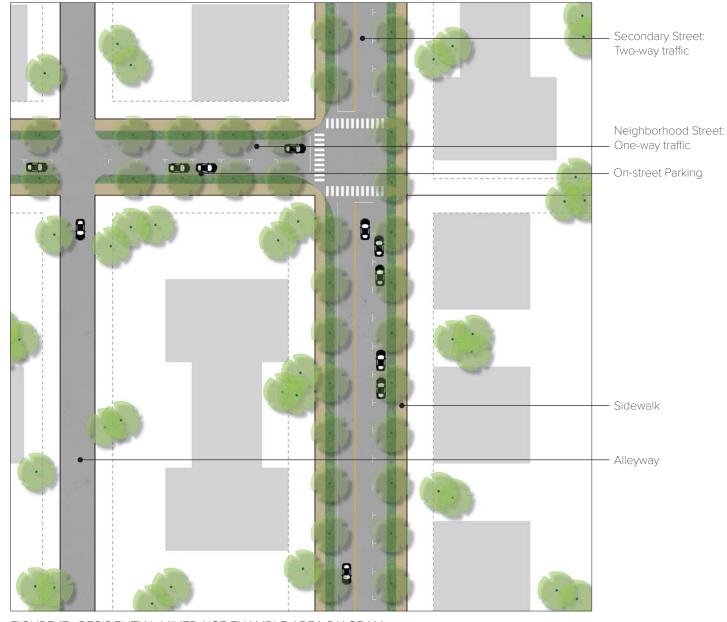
RESIDENTIAL MIXED USE EXAMPLE AREA DIAGRAM
